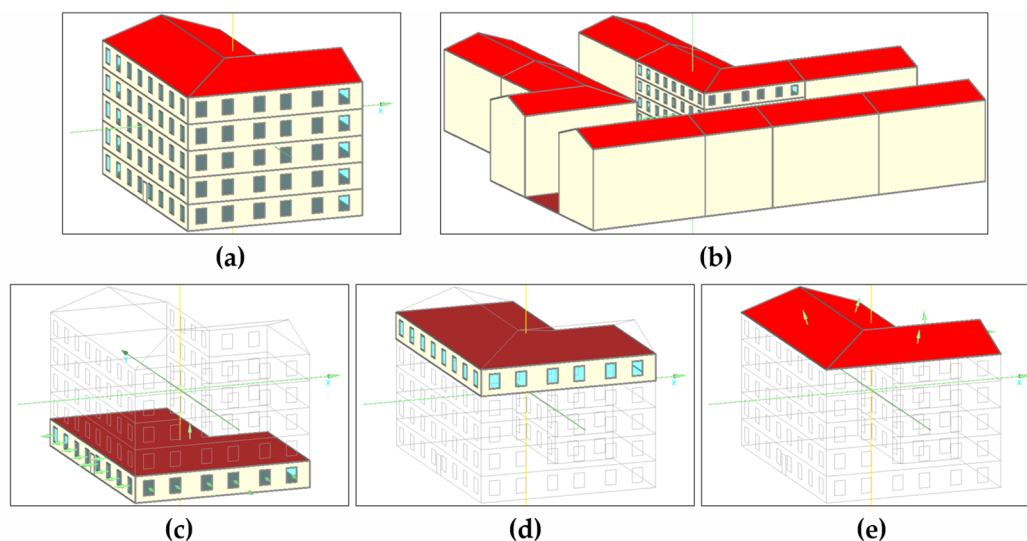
3D building model in WUFI[®] plus: without nearby buildings (a) and with them (b), as well as division of the building into zones: first floor (c), fifth floor (d) and unused attic (e).
